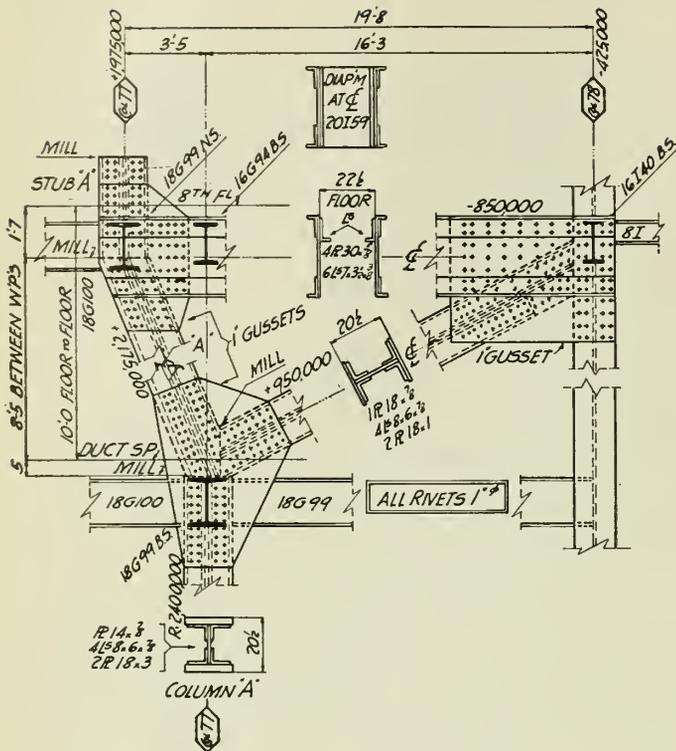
Truss Between Columns 77 and 78—Duct to Eighth Floor.
